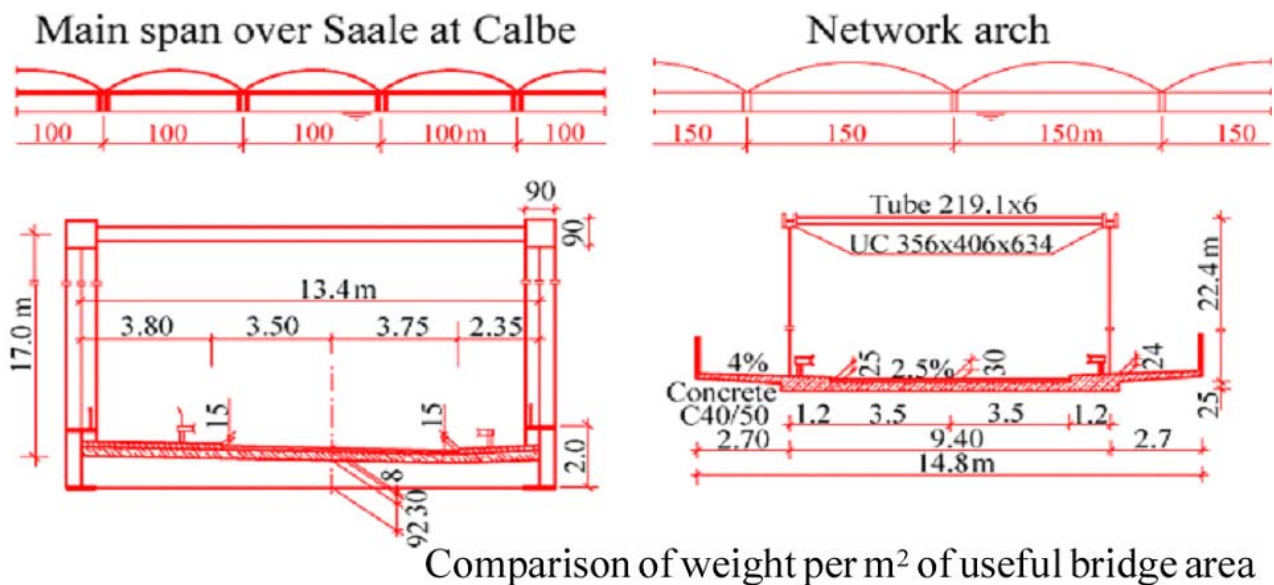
Other steel arch road bridges compared to optimal network arches.
